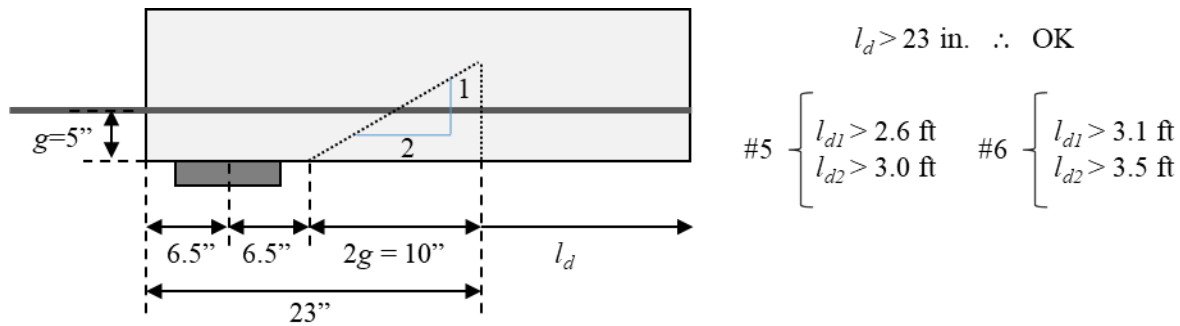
Additional detailing check for embedment of reinforcement into the girder, based on Miller et al. [98]
